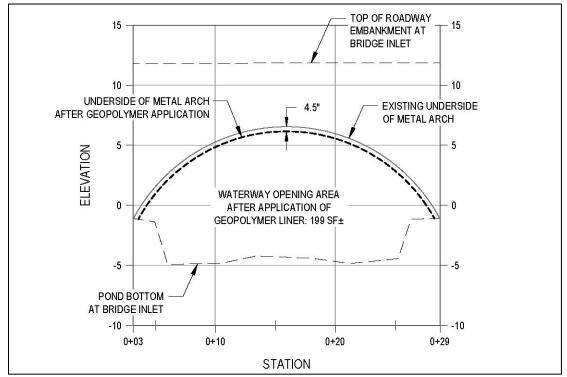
Bridge Rehabilitation Alternative 1 inlet cross-section
